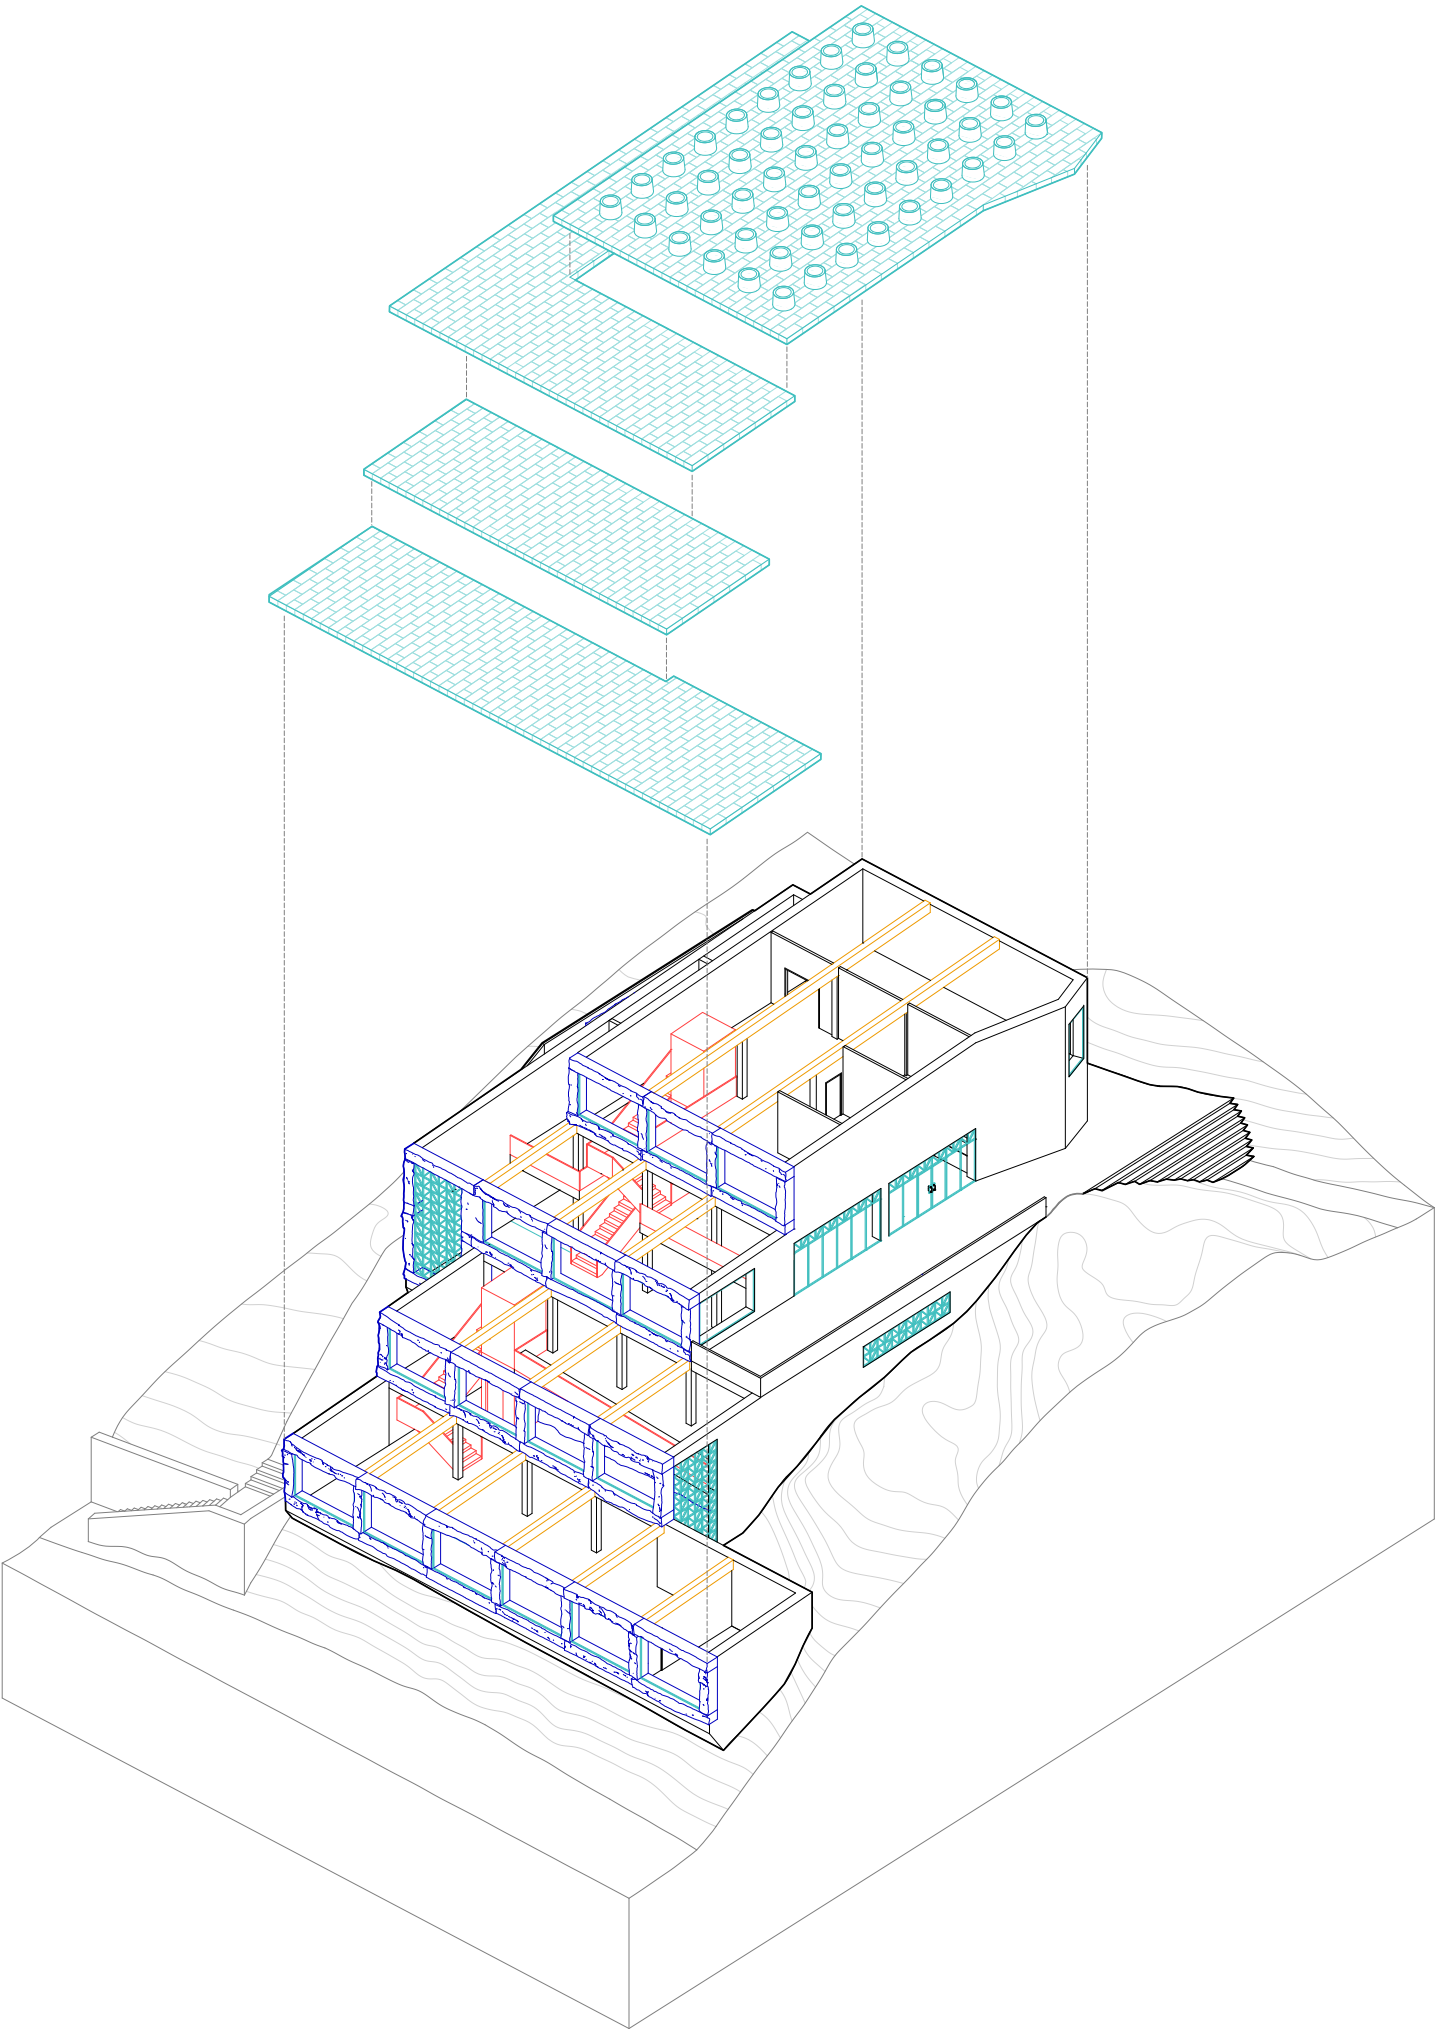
The exposed wooden roof construction is a reference to the area's vernacular wooden architecture.
